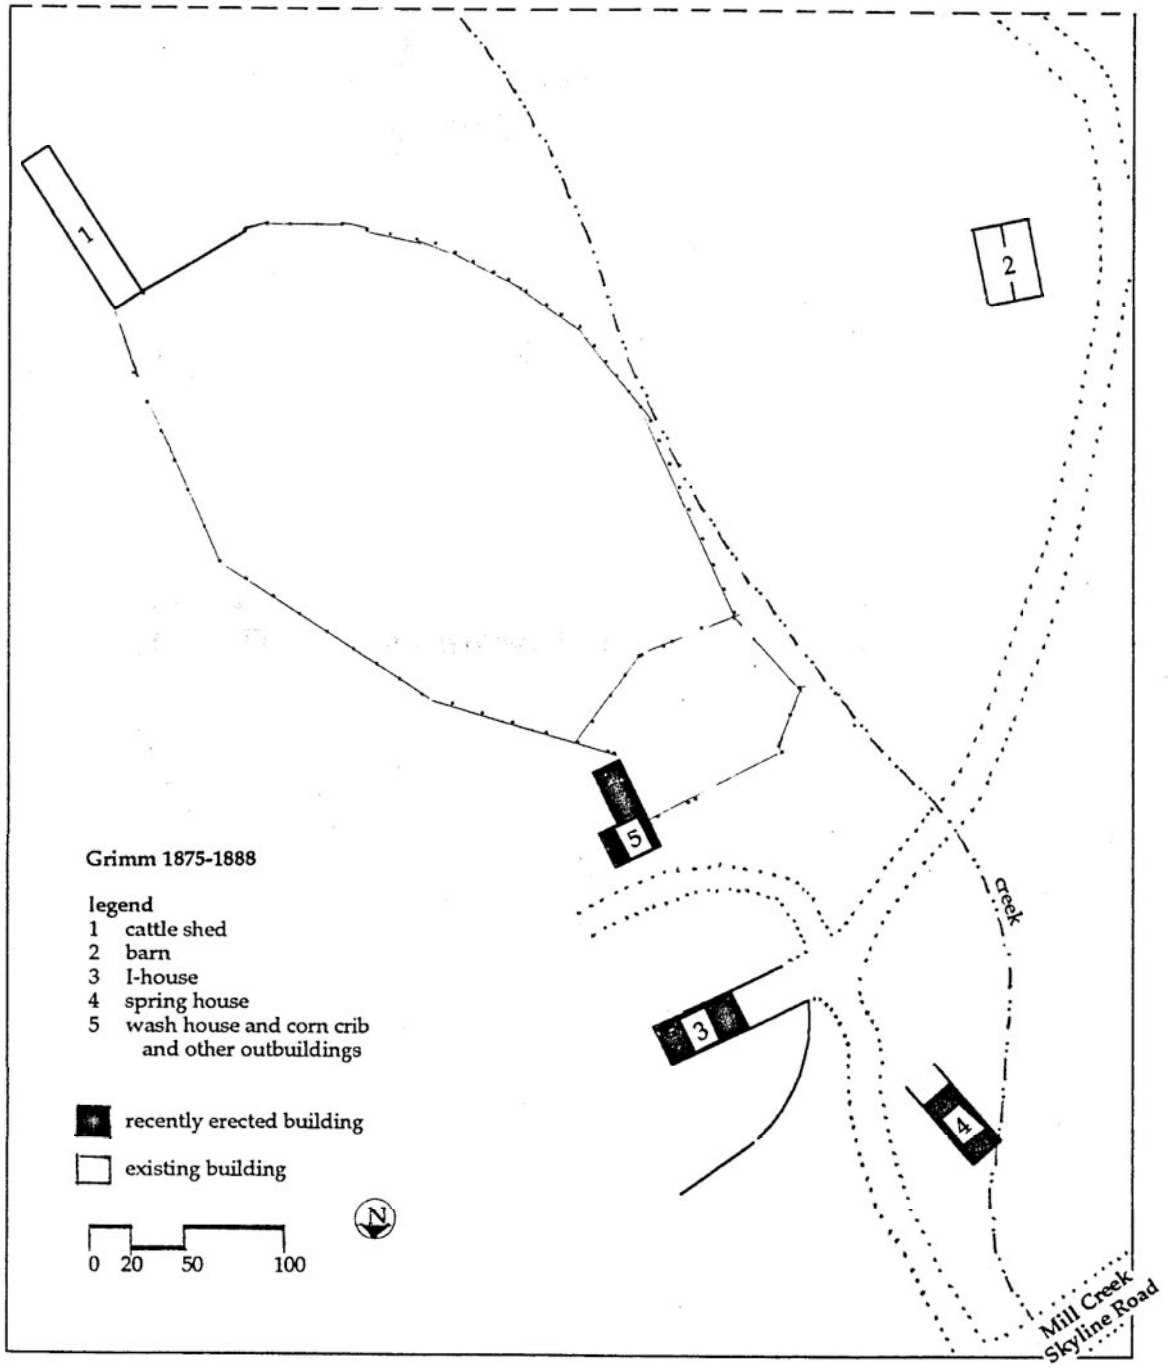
Site plan, Grimm I-house and outbuildings, 1875-1888
